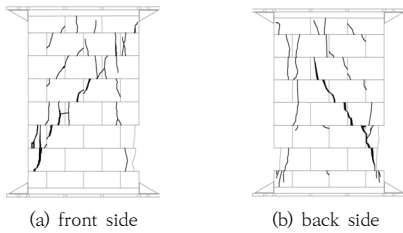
Wall crack pattern (L=1,200 mm)
